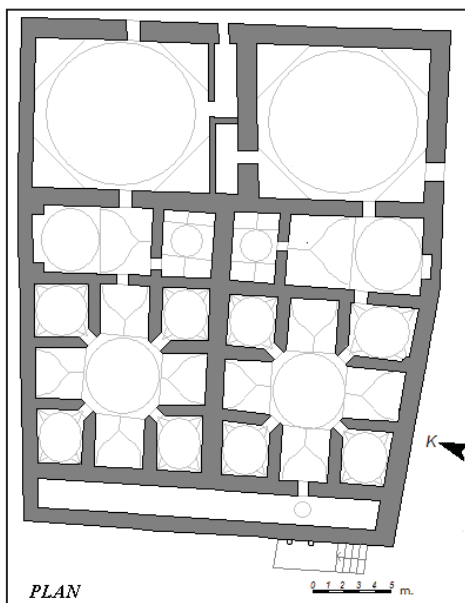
The plan of Mustafa Ağa Hamam and its view (Akın, 2009)
